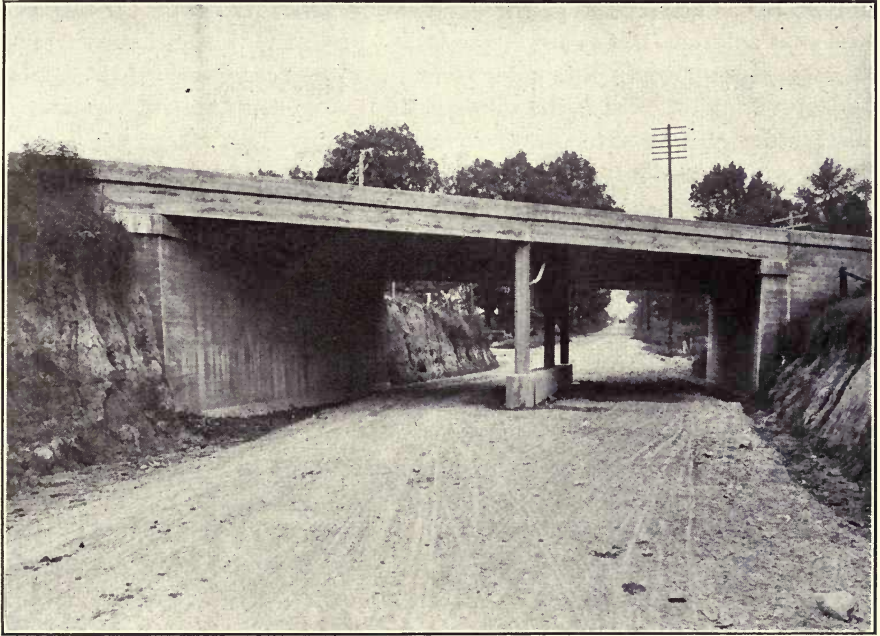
BRIDGE WITH CONCRETE FLOOR, ILL. CENTRAL R. R.
